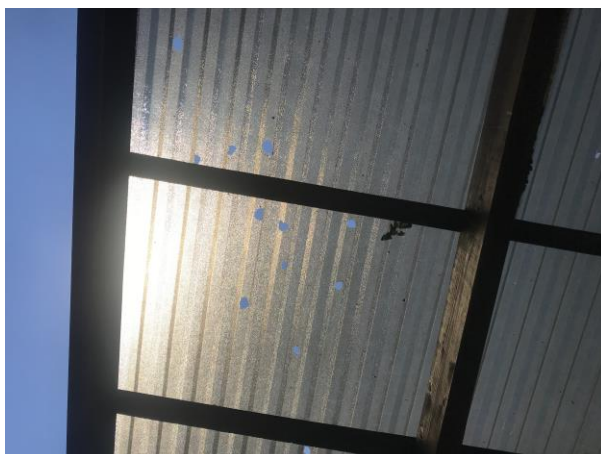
Examples of damage at roof covering (source: Kamila Kempna/Czech Republic)
